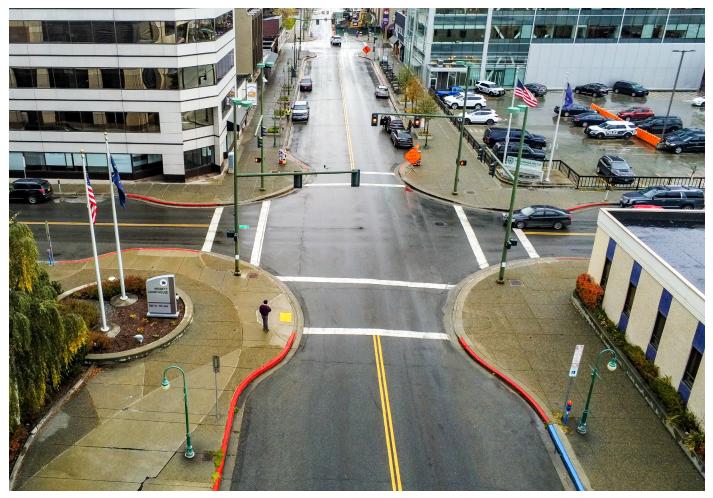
Curb Bulb-outs in Downtown Anchorage, Alaska
